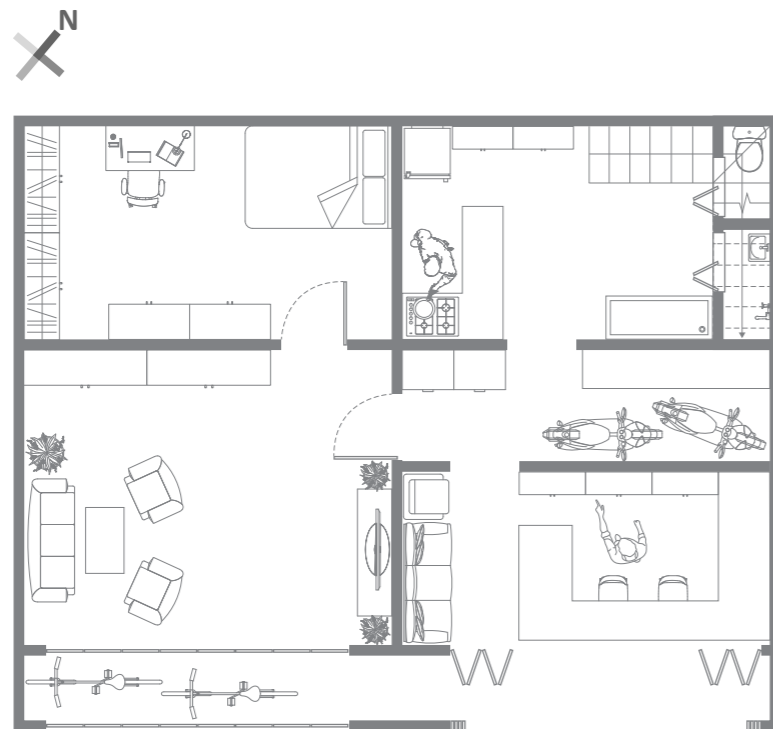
Grandparent's house old floor plan before urban redevelopment (Ground Floor Plan)
